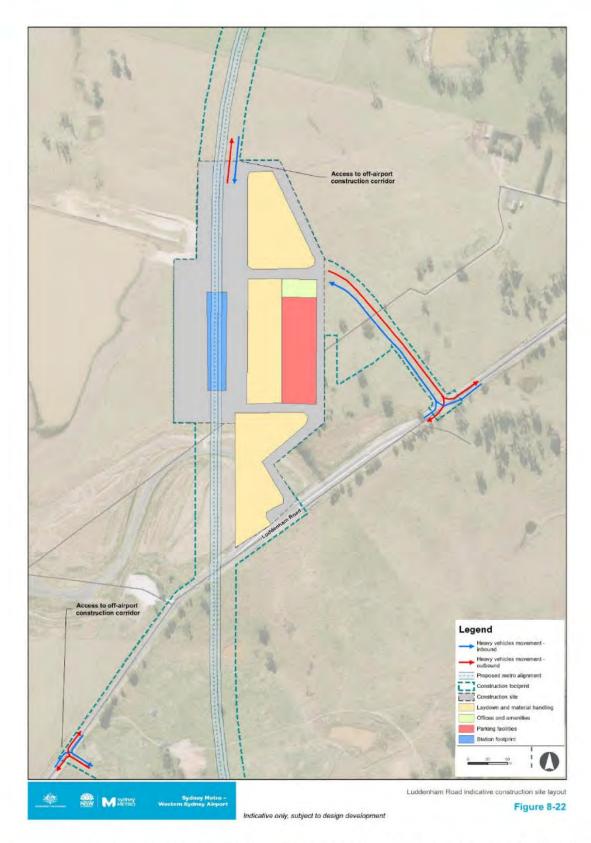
Luddenham Road indicative construction site layout – Approved Project (SMWSA EIS, 2020)
